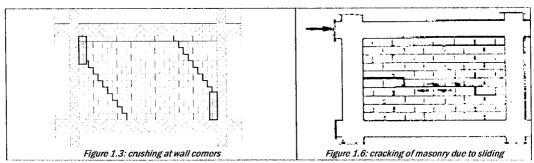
Failure modes of façade masonry walls within reinforced concrete structural frames.
